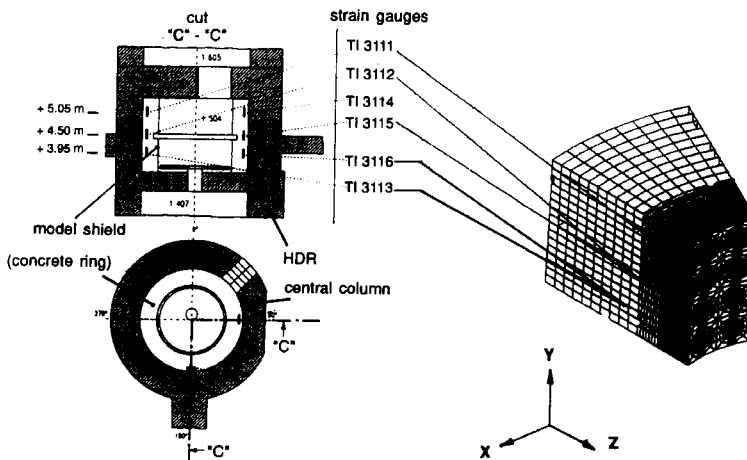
Concrete ring embedded into HDR-building structure (left) with position of deformation sensors and sectional FE model for calculations (right)
